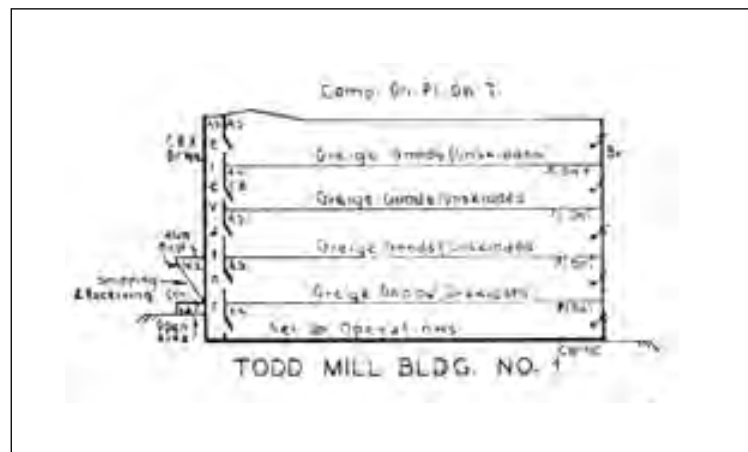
Factory Mutual Insurance Co. *Mill Realty Co.* 1965. West-east cross-section through Todd Building No. 1. Scale: 1 inch= 30 feet (approximately).
